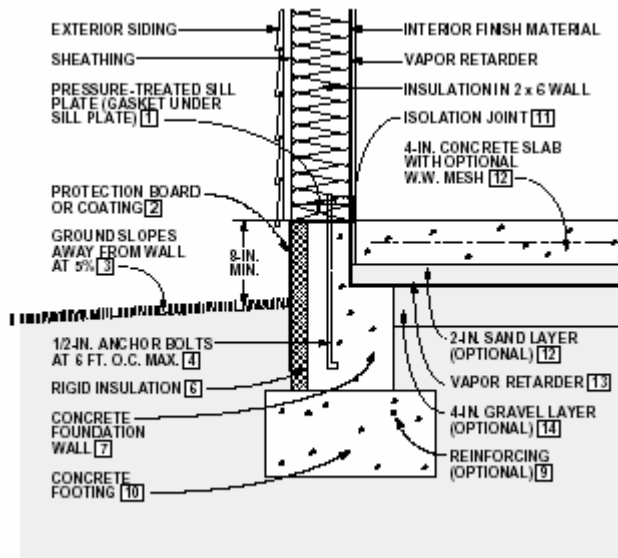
illustrates a slab-on-grade with a concrete foundation wall. Rigid insulation is placed vertically on the exterior face of the foundation wall. The 2 x 6 above-grade wood frame wall overhangs the insulation. The foundation wall is designed to permit vertical movement of the floor slab.
